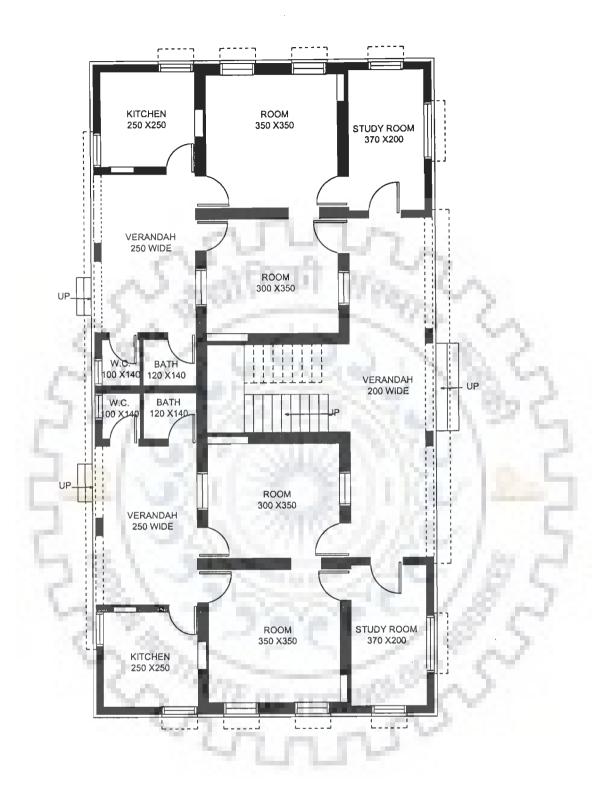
(a) - Ground Floor Plan of Project No. 13 (Total Plinth Area = 318.87 sqm; Total Floor Area = 265.26 sqm)
